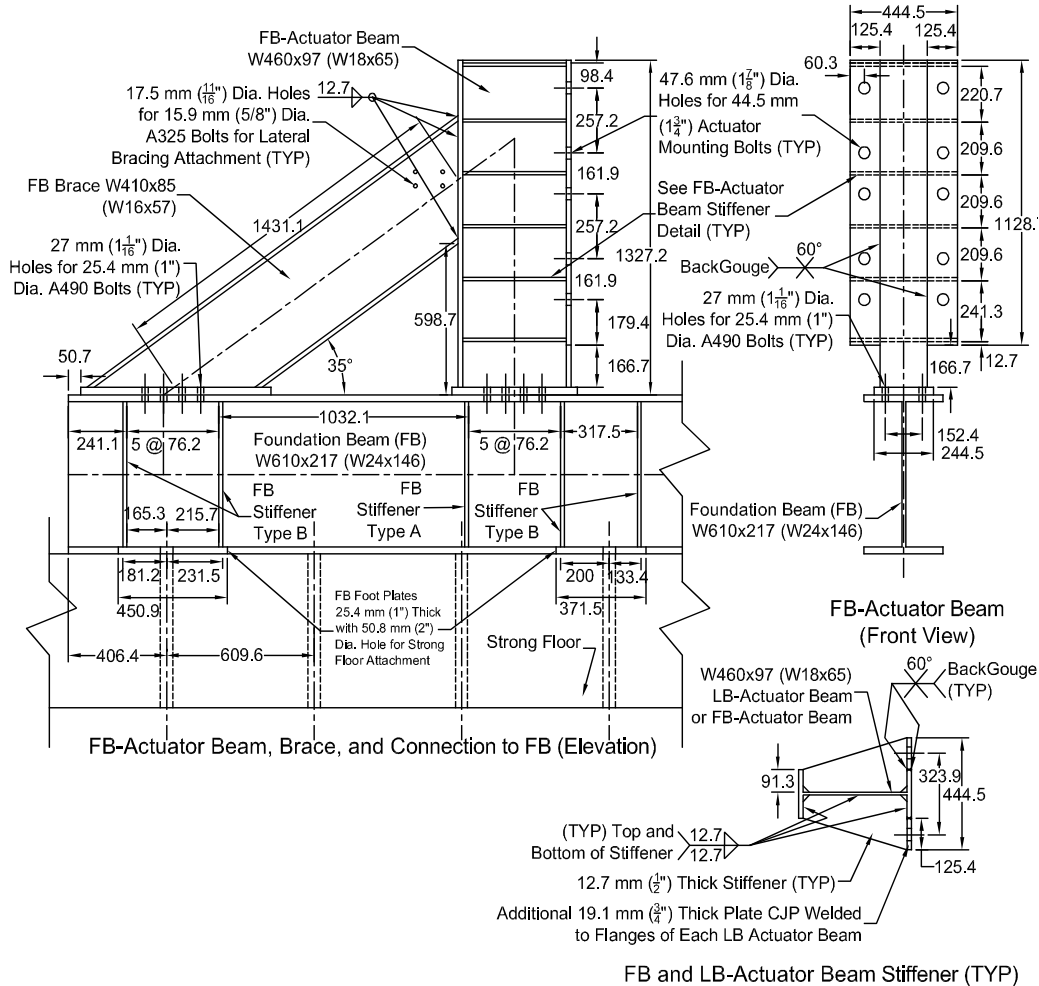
FB Actuator Beam and Brace and Connection to Foundation Beam
